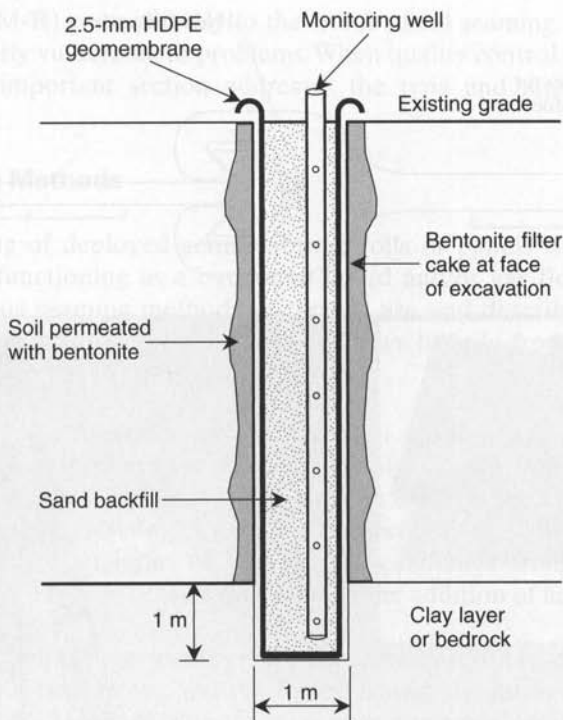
Concept of placing a geomembrane in a slurry-constructed trench to form a double seepage cut-off wall. (After ICOS of America, Inc.)
